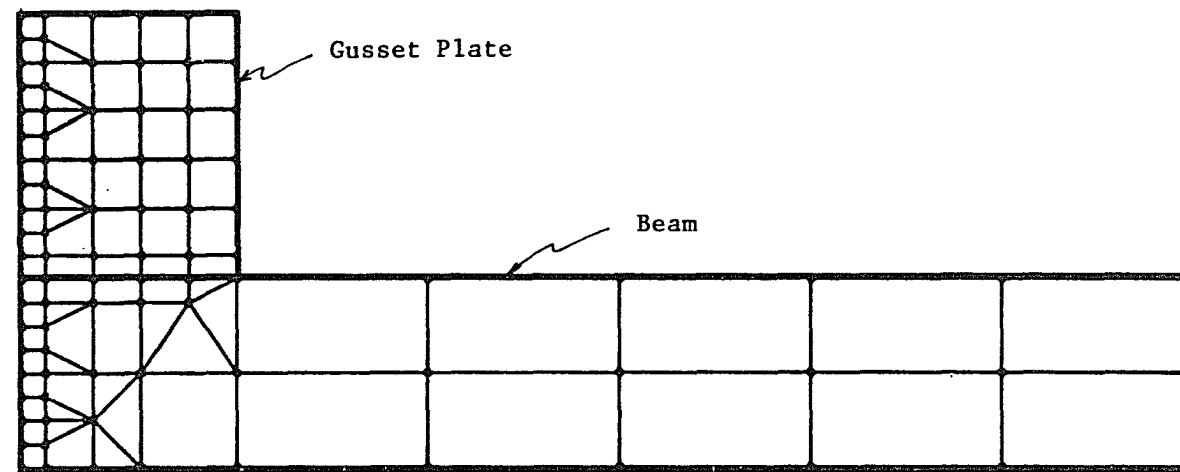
Finite Element Model of Diagonal Bracing Connection.
